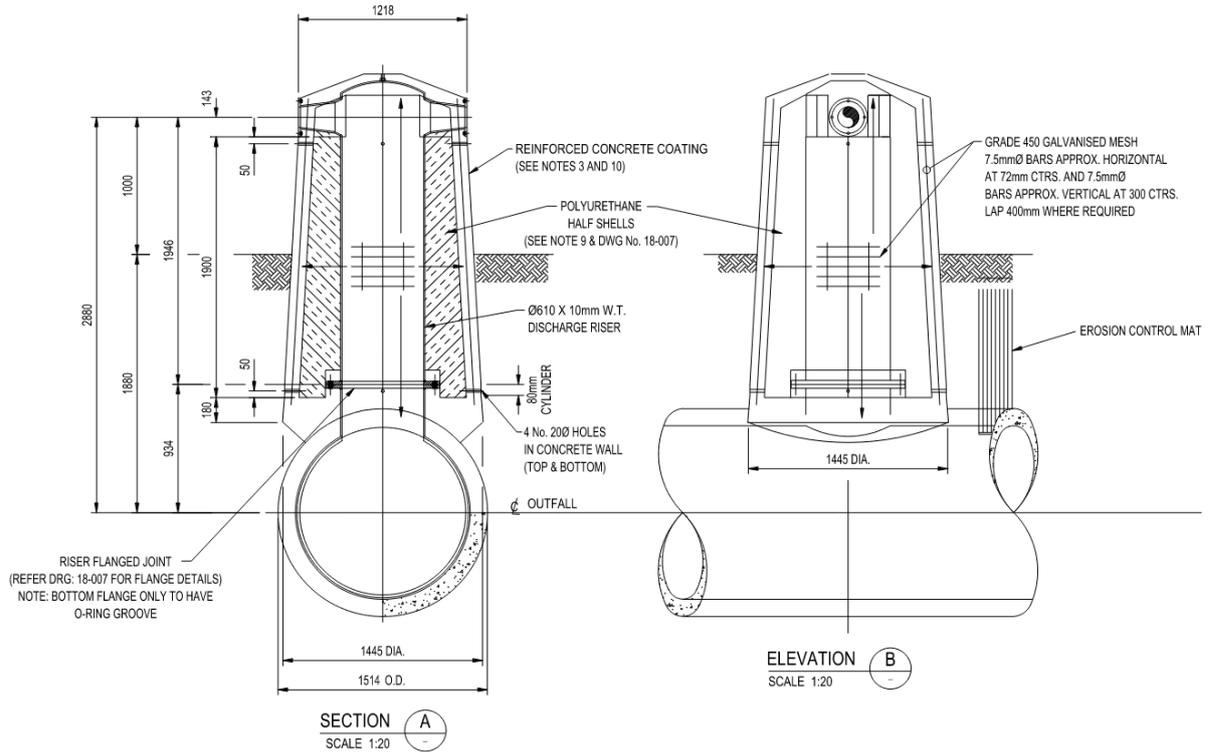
Moa Pt Ocean Outfall Diffuser Riser Section and Elevation (Extracted from As Built Drawing 951096_18-006 Rev D)
